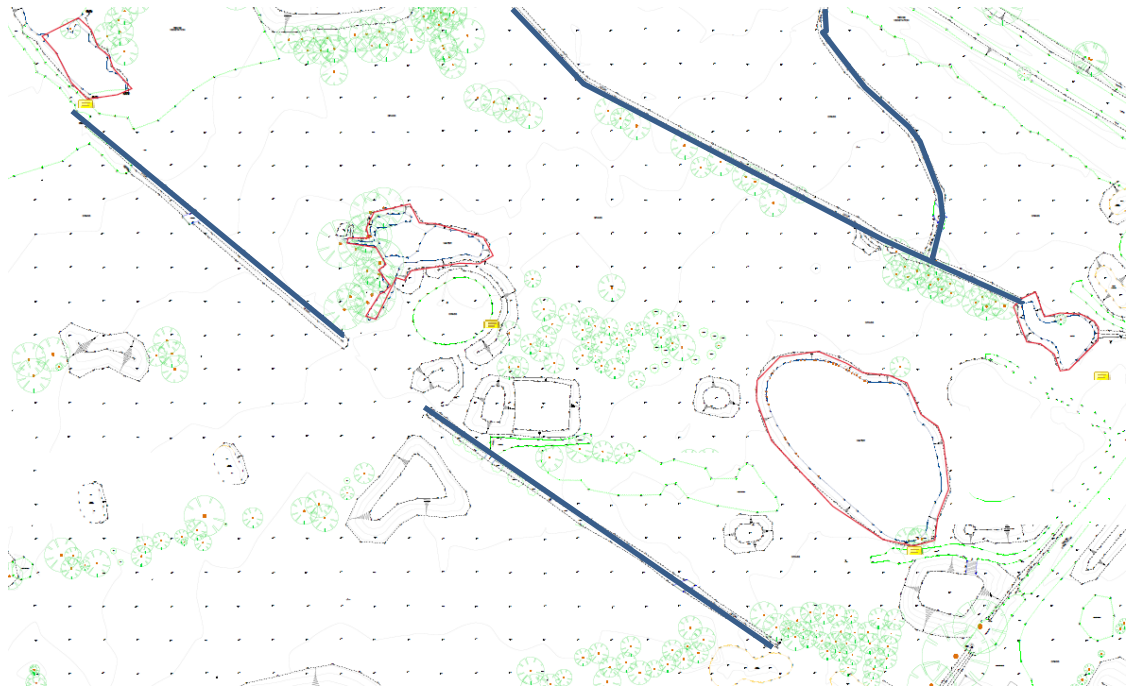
Existing ponds (in red) and ditches (in blue) to be removed. Plan from the Curtins FRA for the proposed development
